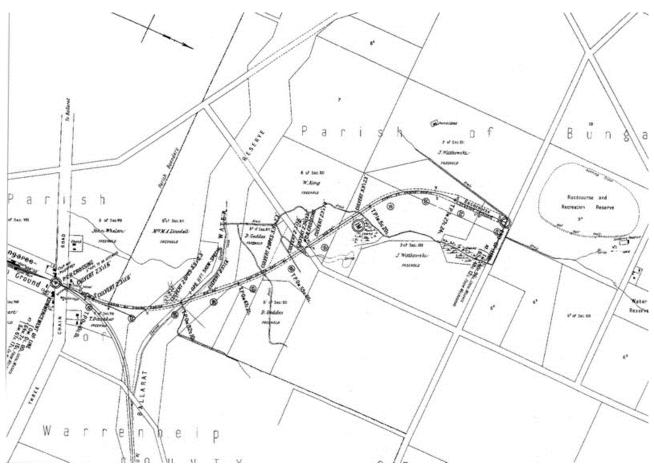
J. Bailing, Railway Construction Plan prepared from the Permanent Survey, October 1900. Source: Cauchi & Guiney, The Bungaree Racecourse Railway, p. 14.
